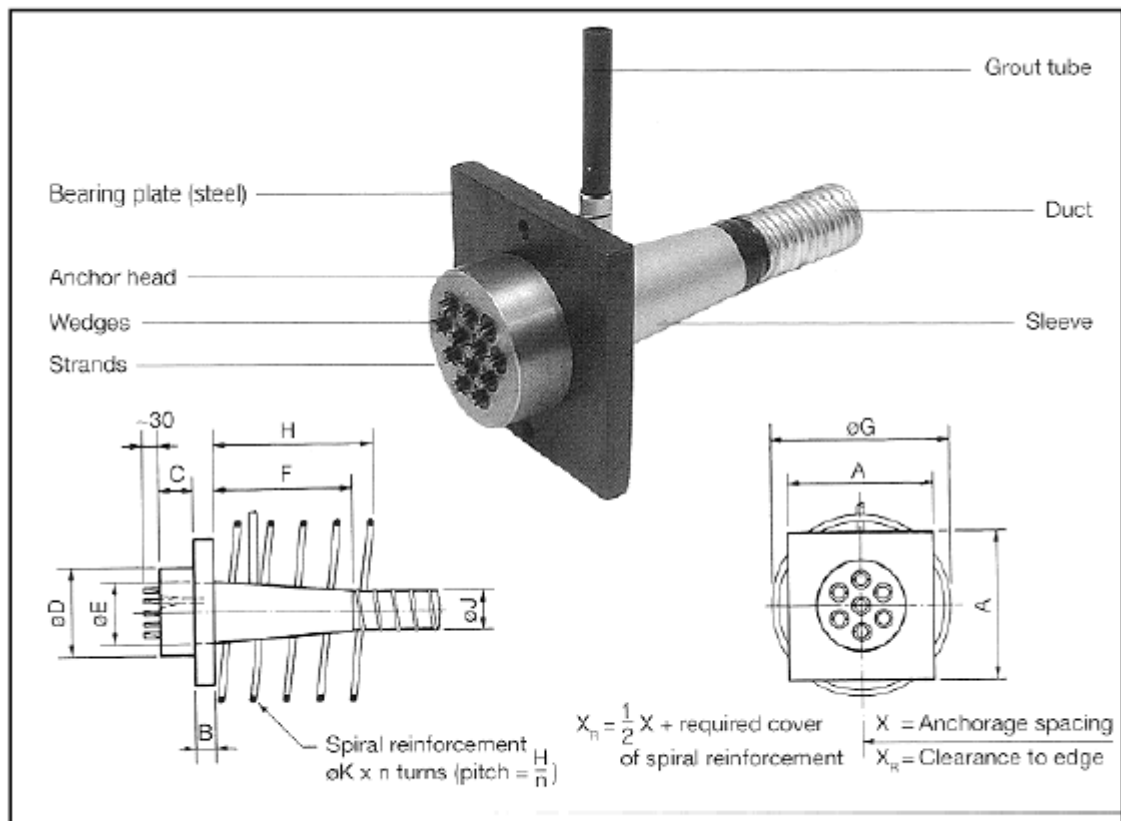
The VSL Type E anchorage is a versatile anchorage.
